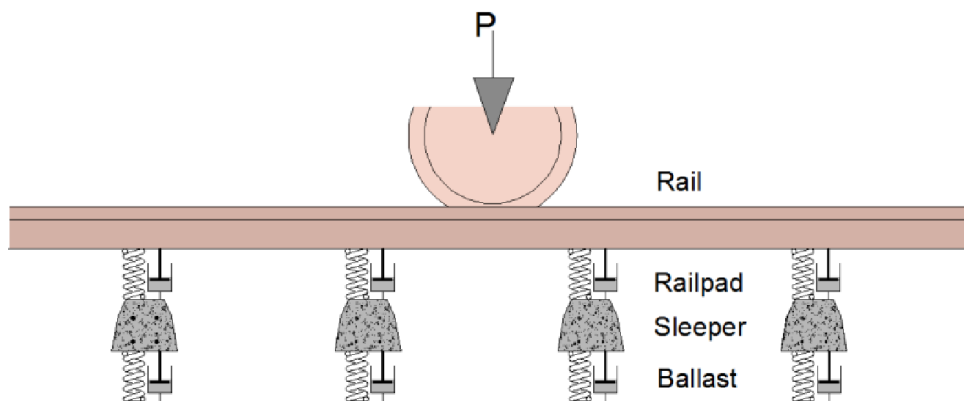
Rail on discrete supports with rail pad, sleeper and ballast^[16]
